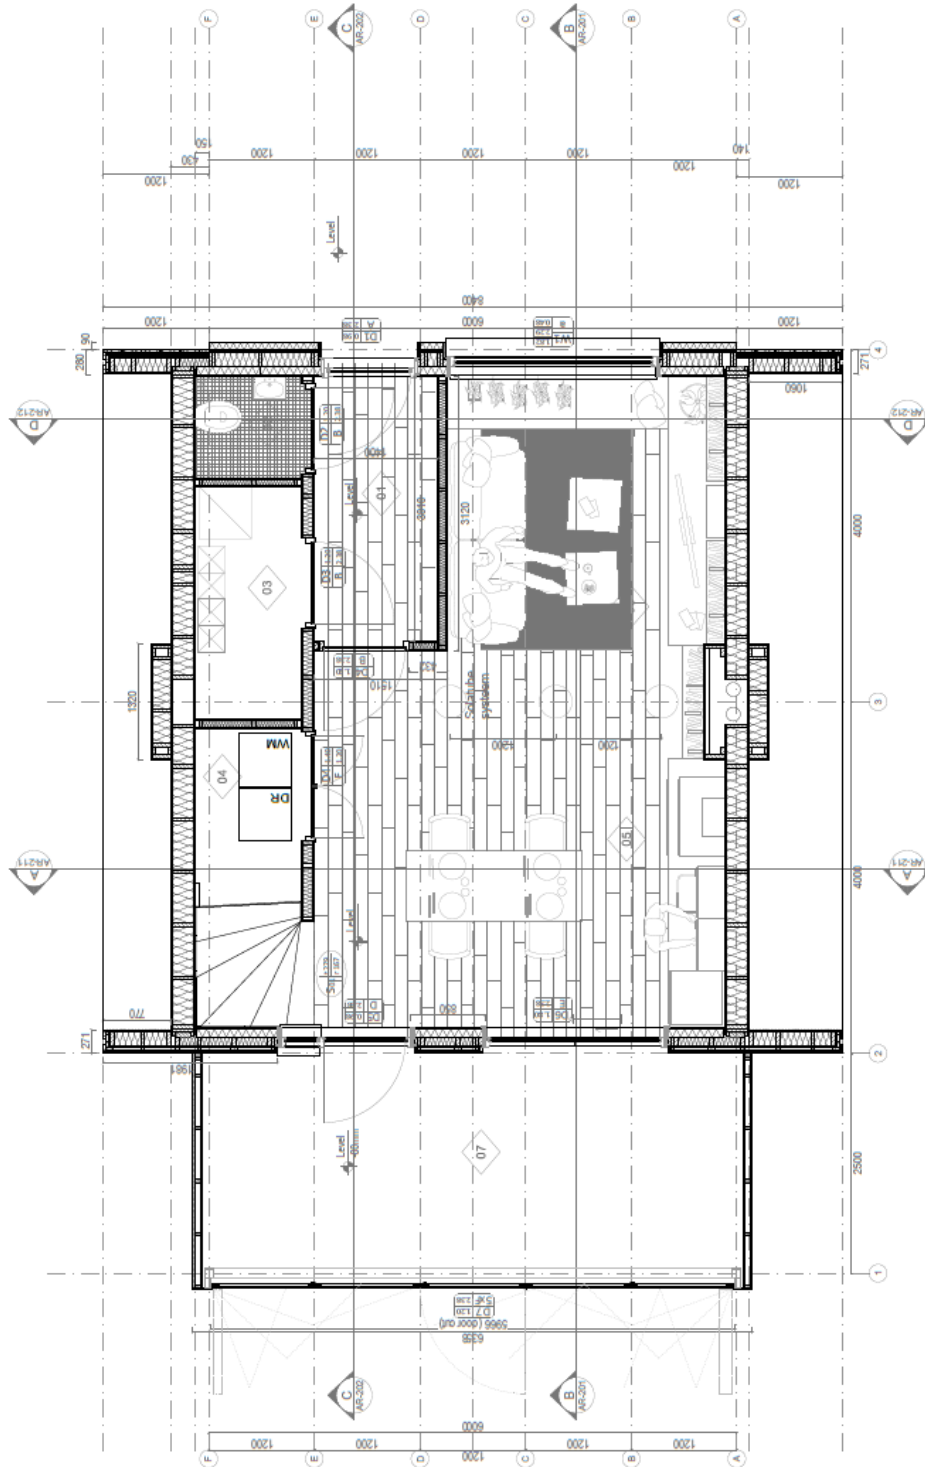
Ground floor plan of prototype house (Pret-a-logger, 2014)
